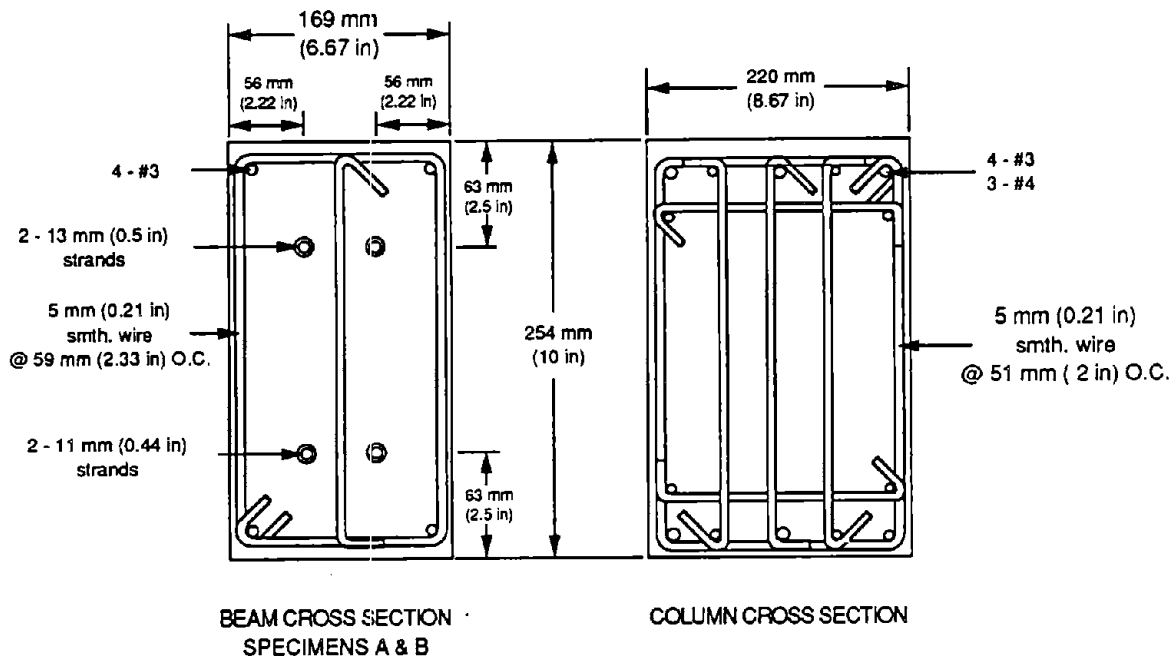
Reinforcement details for precast concrete Zone 2 specimens.
